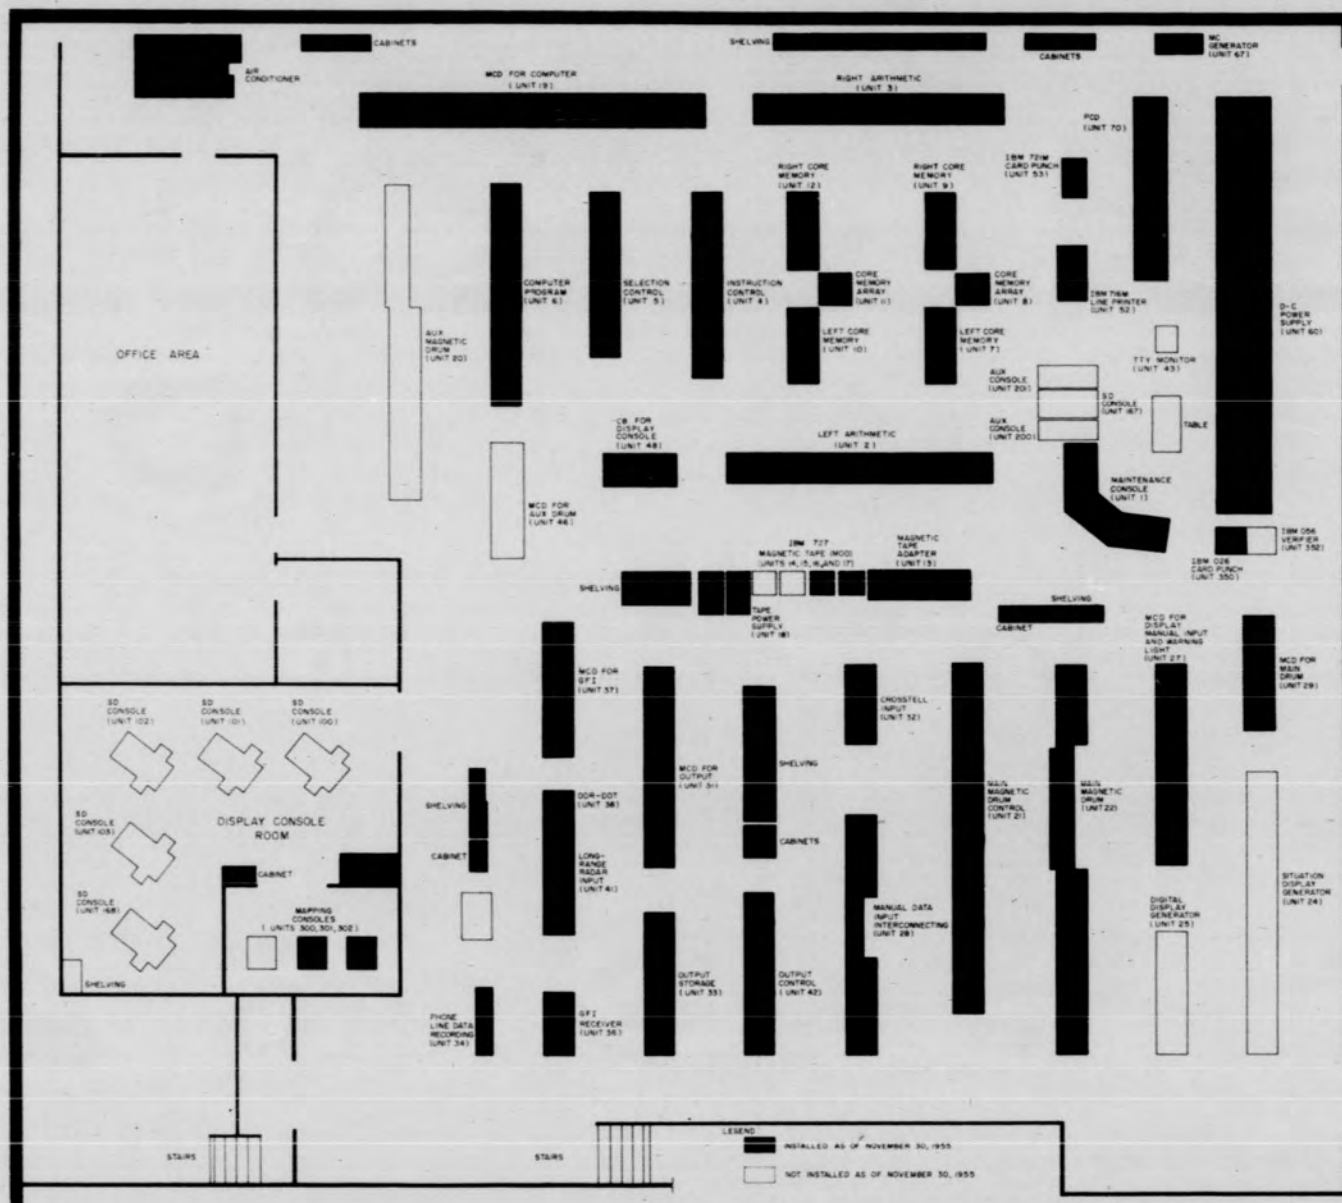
AN/FSQ-7 (XD-2) AT KINGSTON, FLOOR LAYOUT
